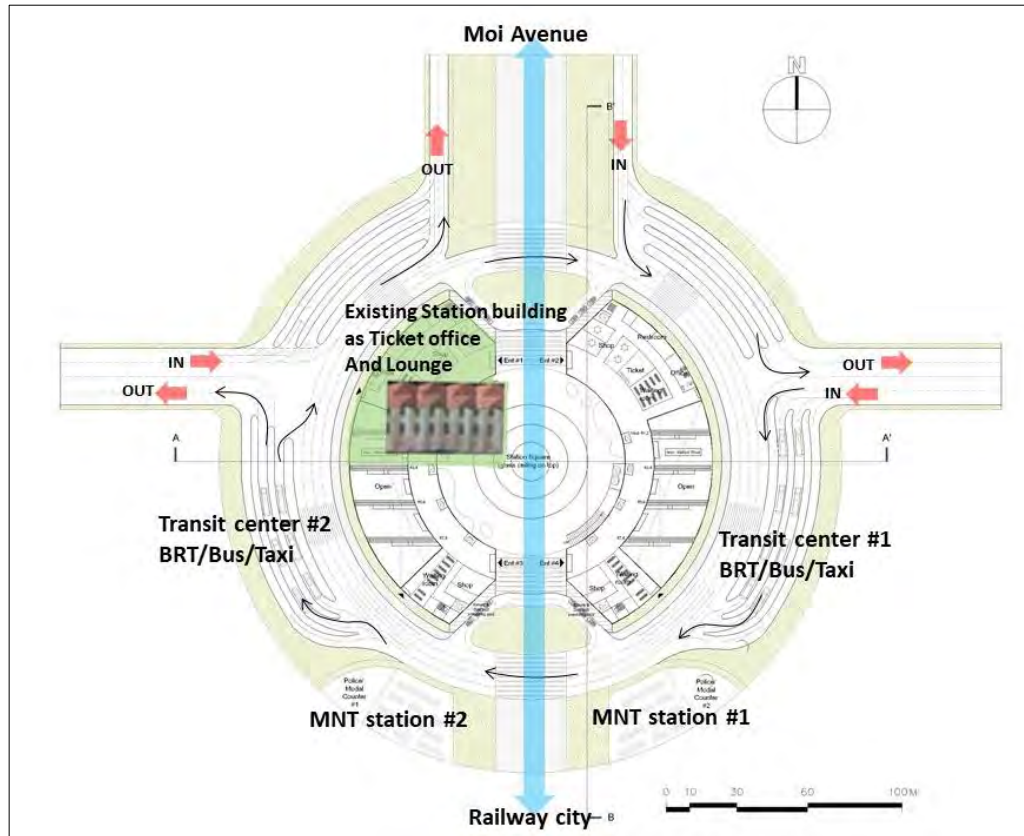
Architecture Drawing of New Central Station (Plan)
